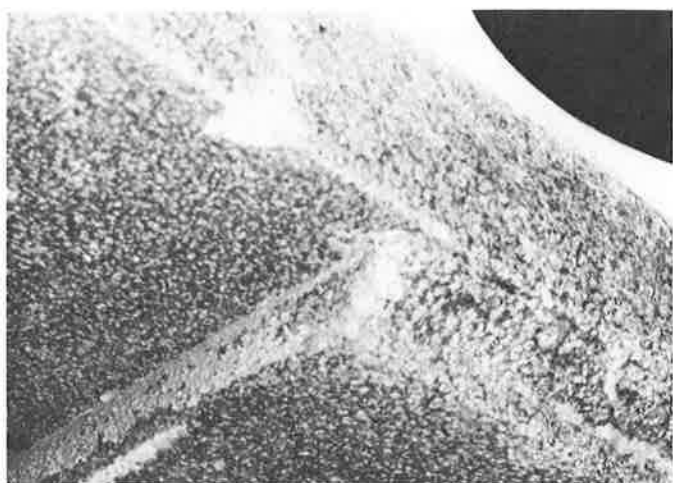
Corrosion Pitting of Beam Flange and Welded Coverplate
